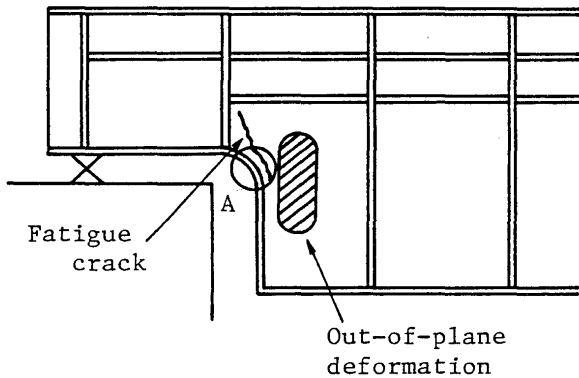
Plate girder with non-uniform section and initiated fatigue crack - Case A -
